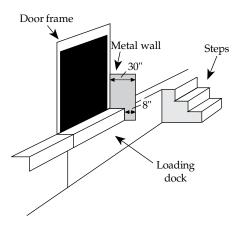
Rodent barrier or guard used between steps, foundation, or other sources of rodent entry and the loading dock doors when doors must be left open at night.
